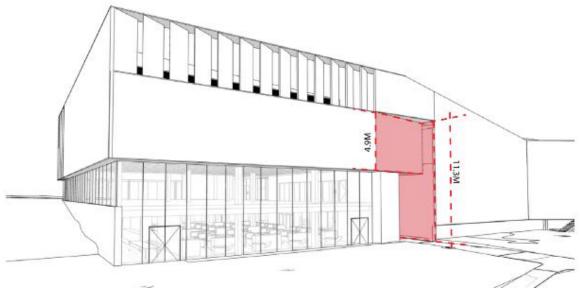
Signage zone location on east elevation, view from Showground Road looking north west Source: Lahznimmo Architects
